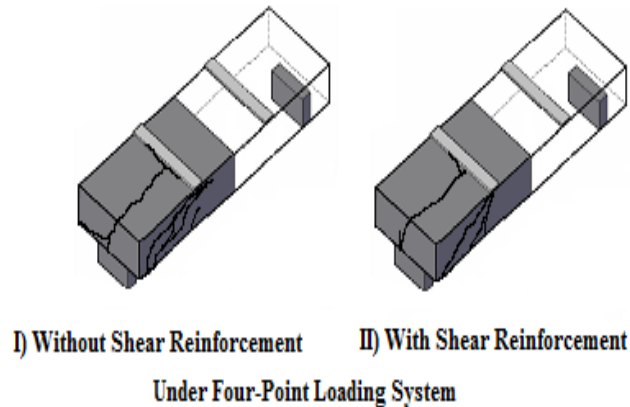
Failure Mode of Wide Concrete Beams for Case 3 of Support and Load Widths.
